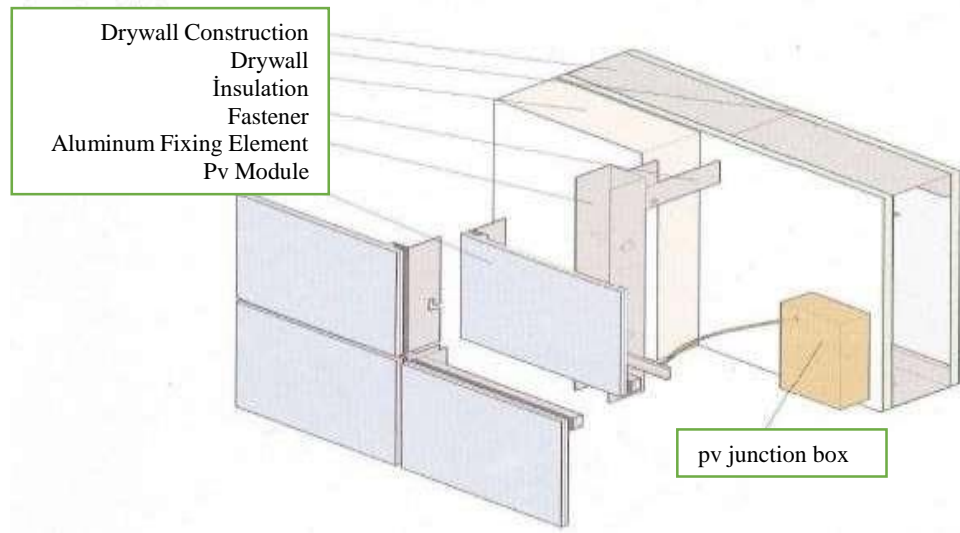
PV curtain wall system details (Gemicioğlu, 2011)
